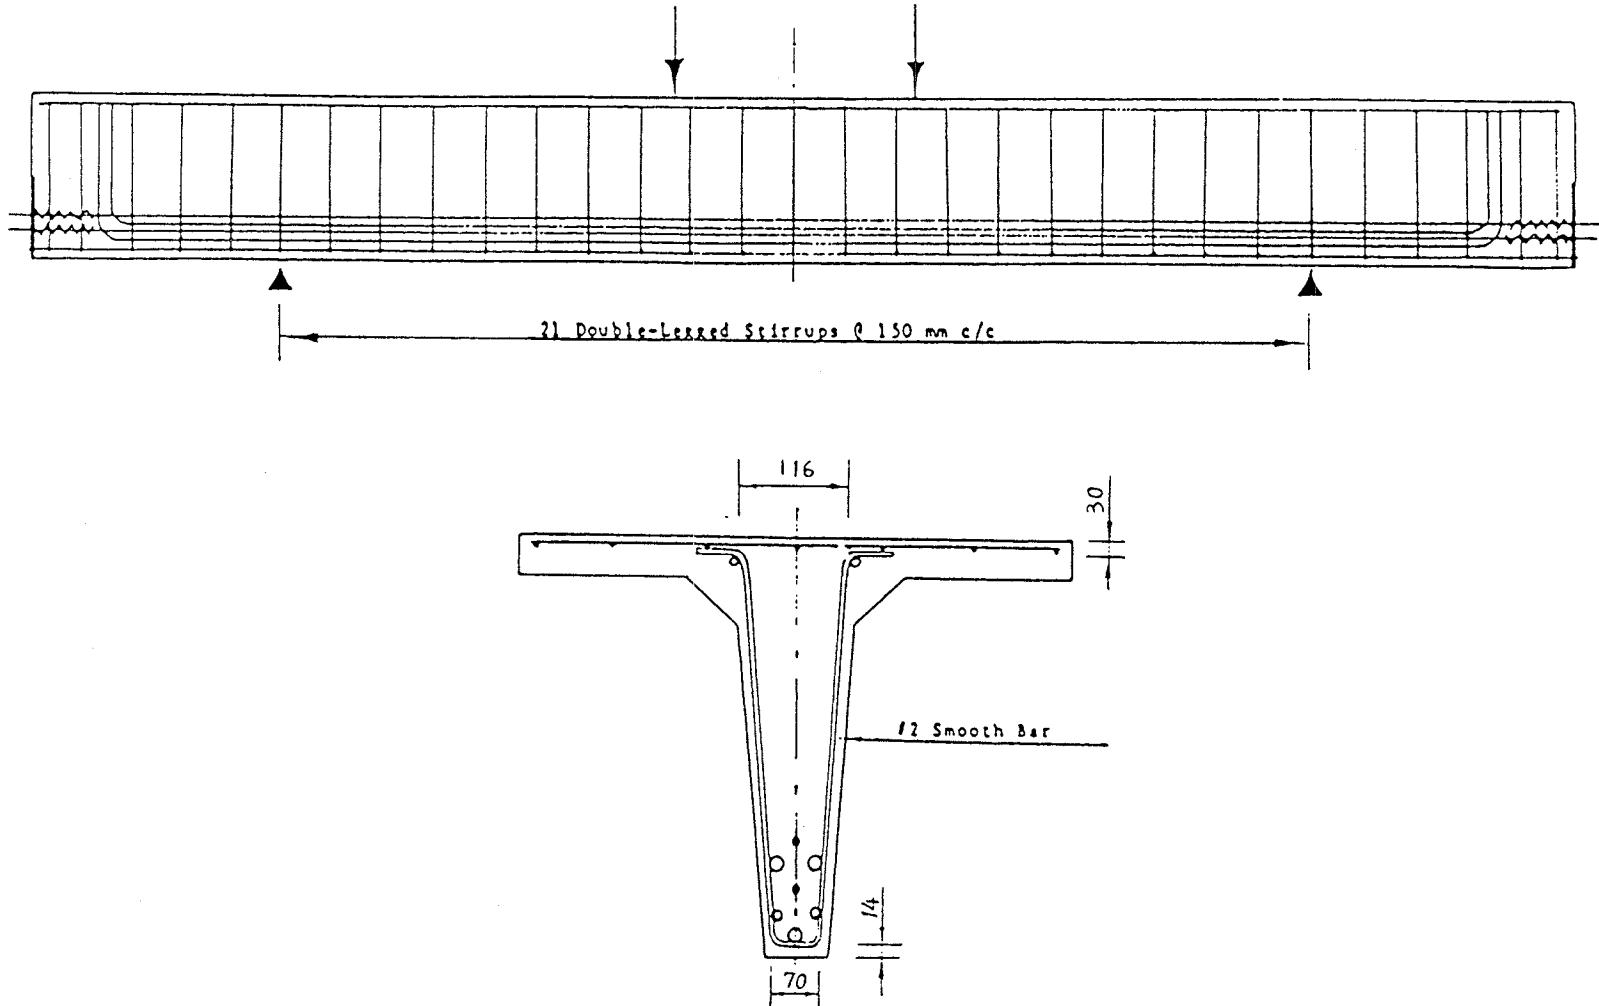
Beam PSN3-D2 with Double-Legged Stirrups
